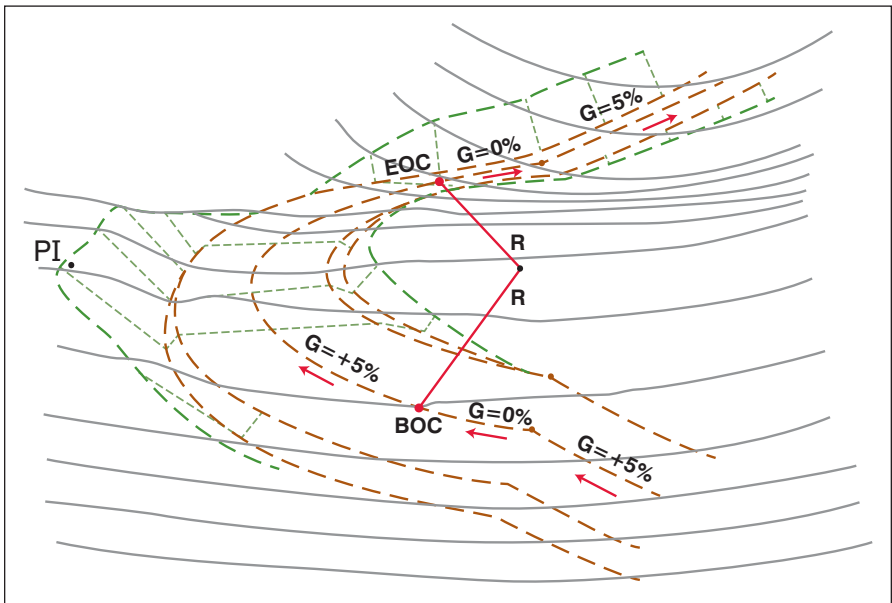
Layout of switchback to allow construction of a constant grade.
